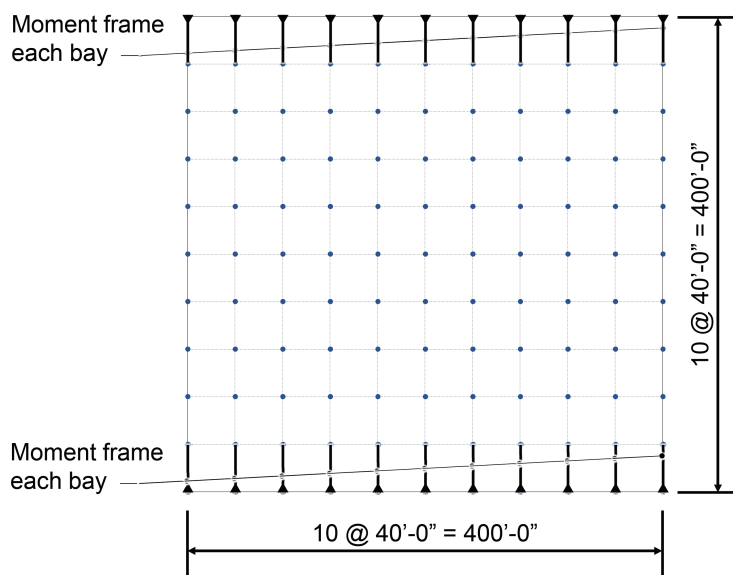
Plan of example building (from Griffis and White, 2013).
